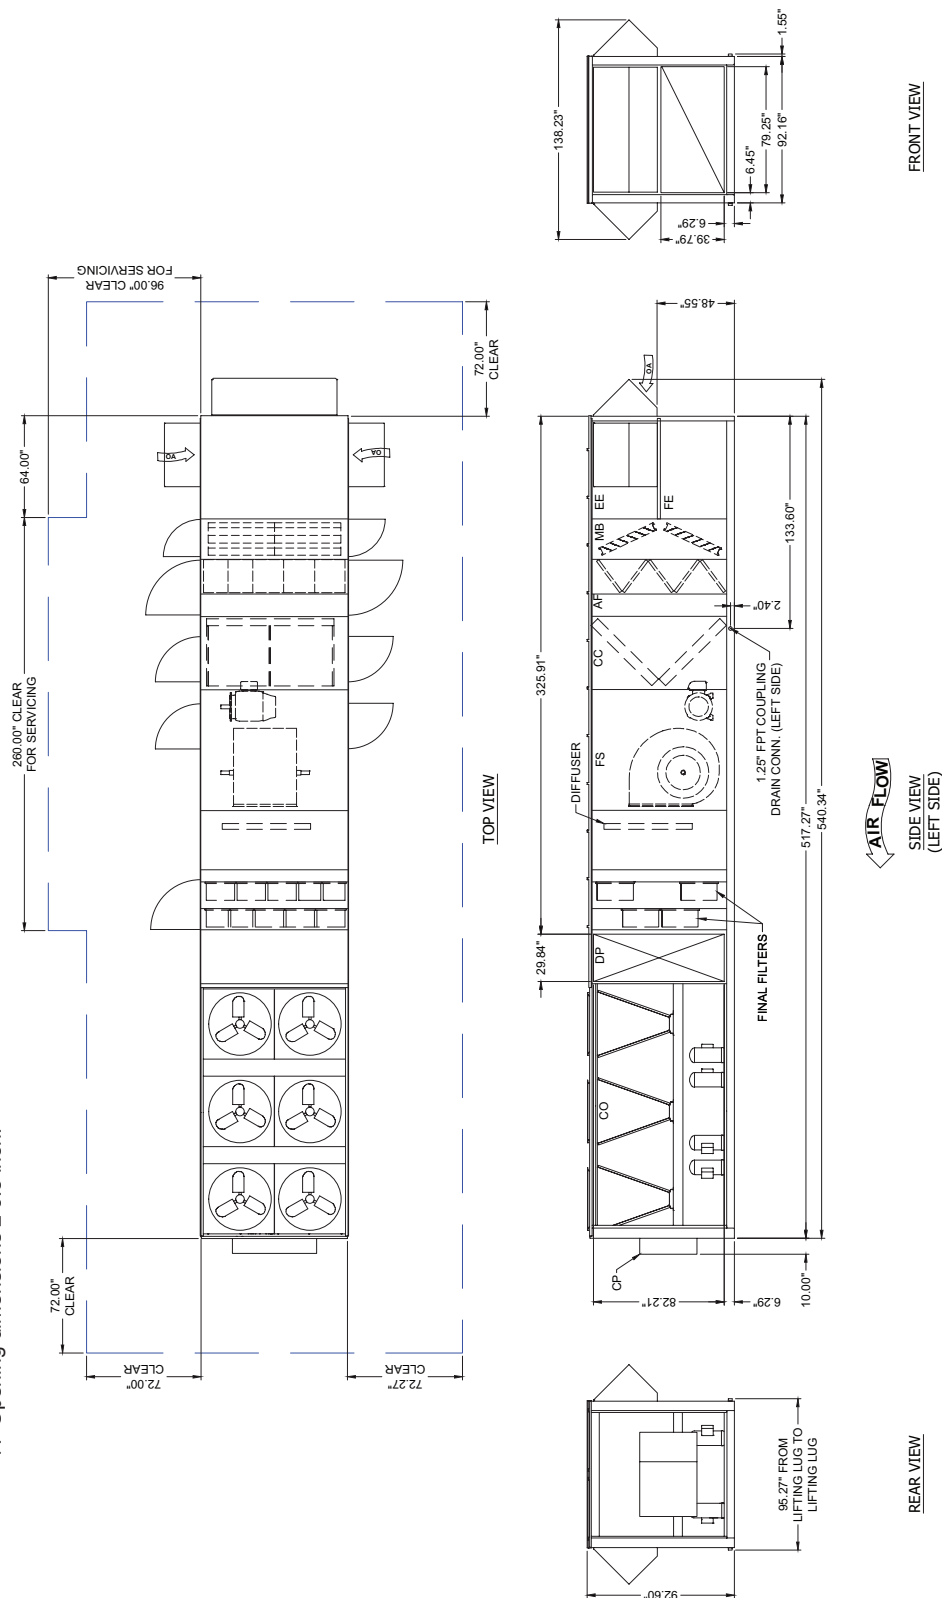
GENERAL ARRANGEMENT DRAWING
